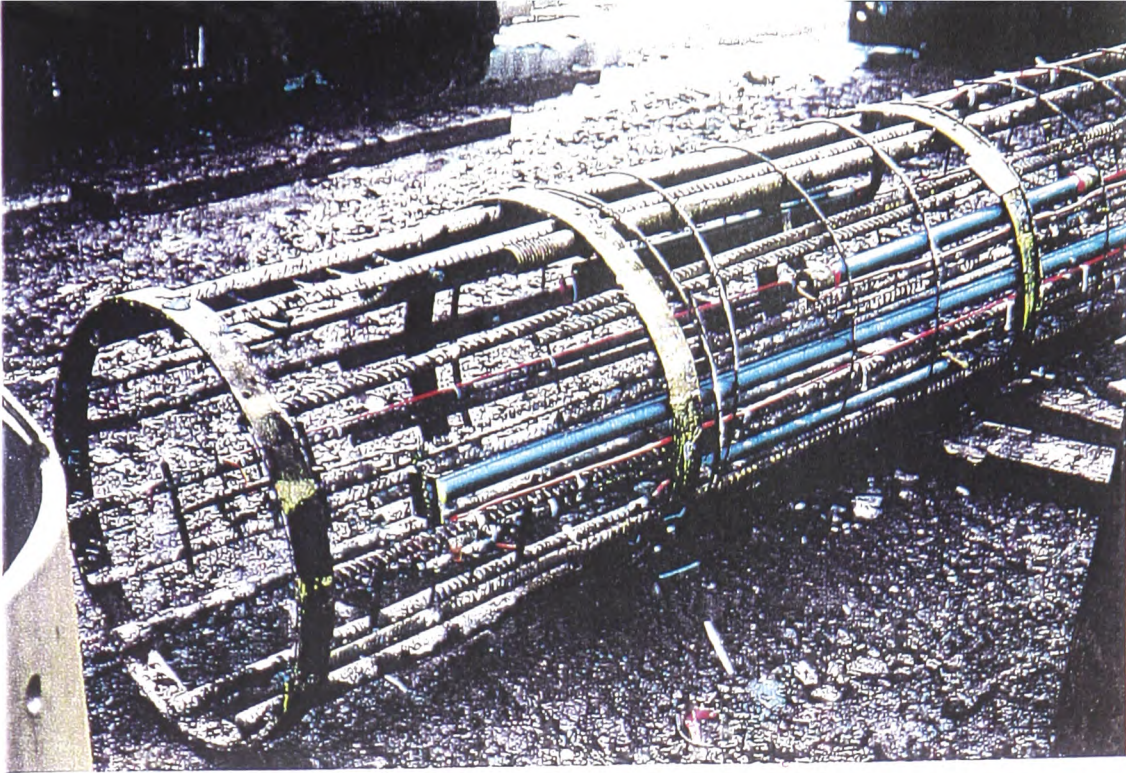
Assembling the pile reinforcement and installing the extensometers
